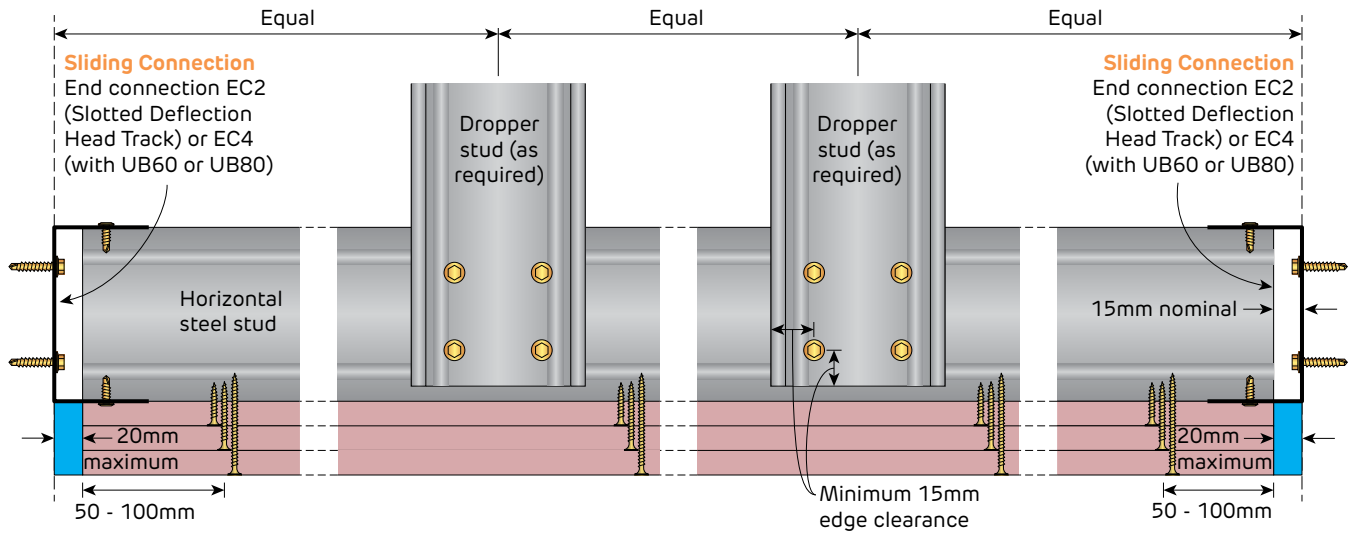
Stud Ceiling Type C1 - 2-way Plenum Braced
